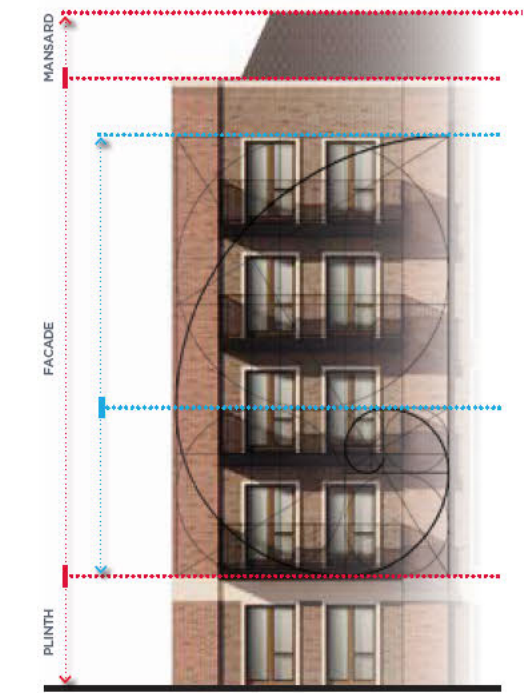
Typical bay elevation Blocks A and B. Source: Architect's DAS.
